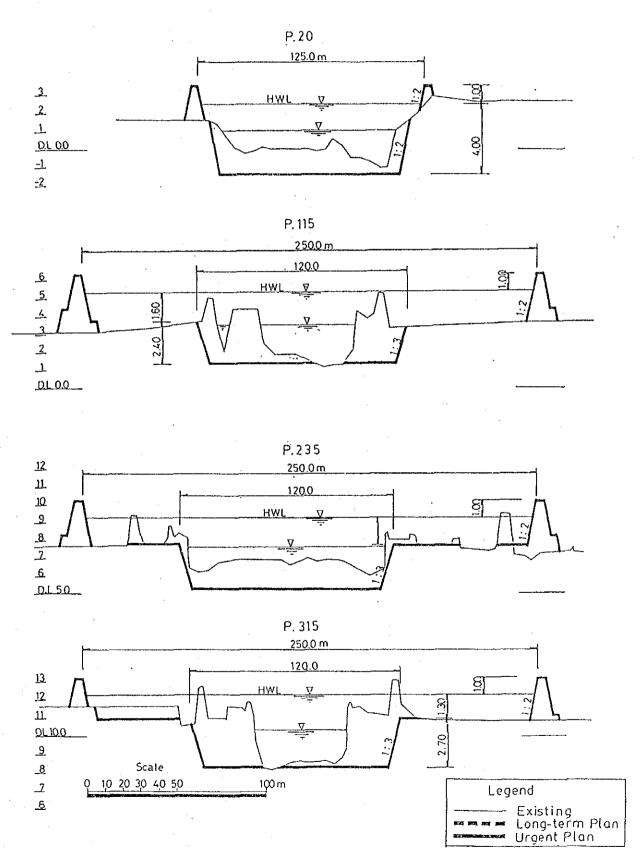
Proposed Long-Term Plan of Asahan and Silau Rivers (6/6)
